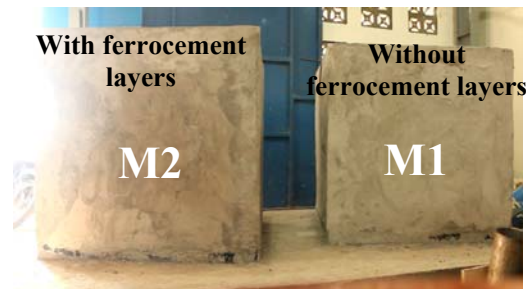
Two models for shaking table test : Model M1 : unreinforced masonry structure; Model M2: masonry structure strengthened by providing full using ferrocement layers on both sides of the walls, act as sandwich structures.
